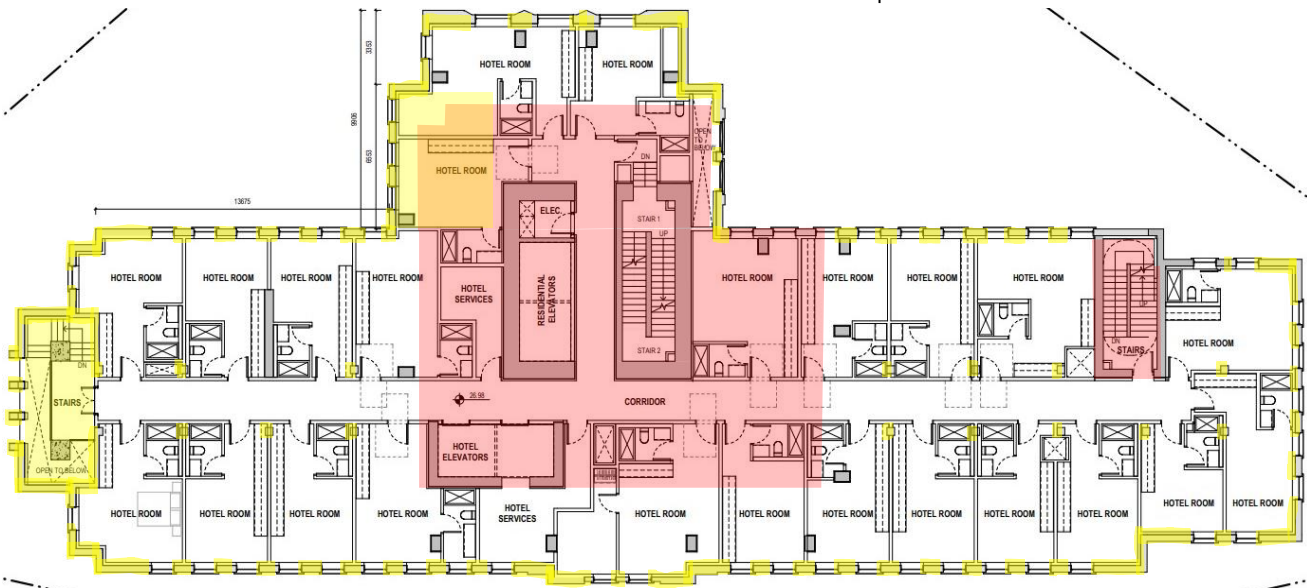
Proposed Level 4 Floor Plan. West stairwell fully retained. Features in the Library will be retained and reused. Internal configuration is relatively maintained. Source: omb Architects + Designers architectural drawings, February 17, 2023.
